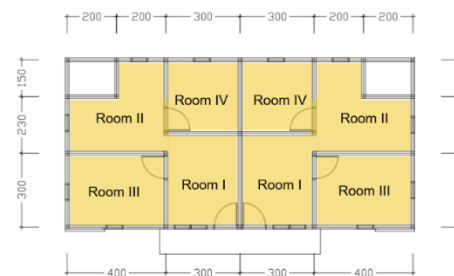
Plans of isolated houses in Lam Neuheun Village, Aceh Besar.
